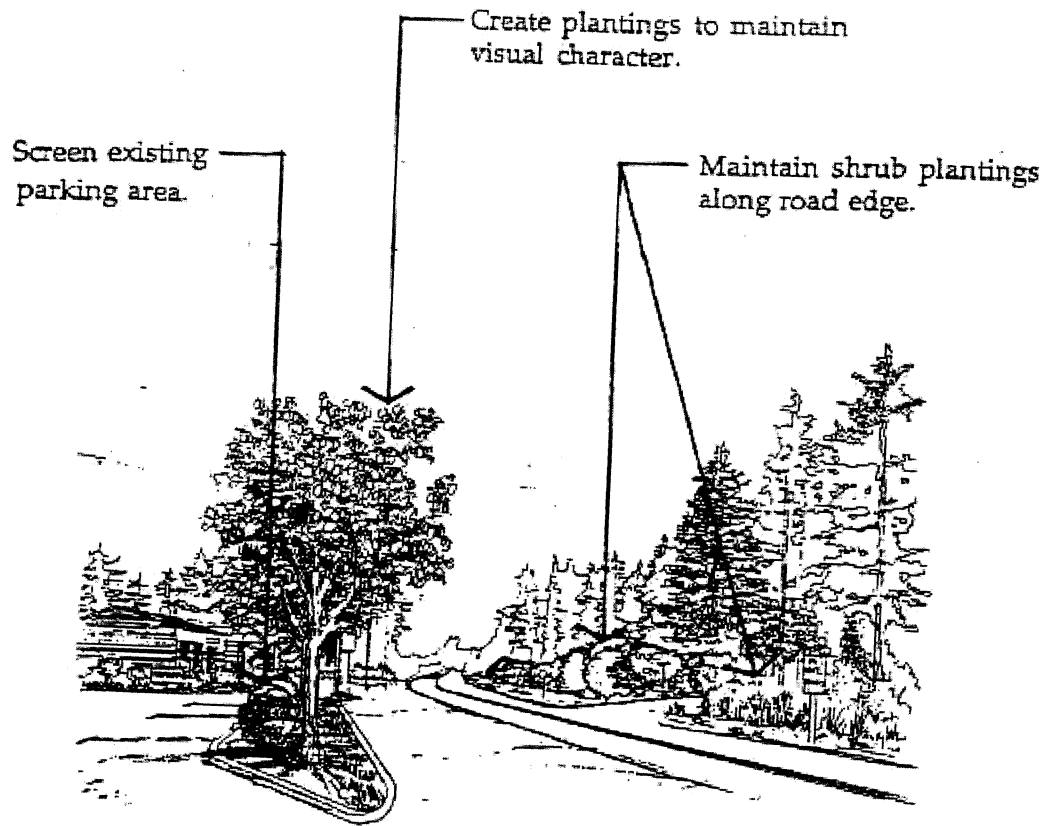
Highway 126 - View southeast to auto-oriented commercial development.
